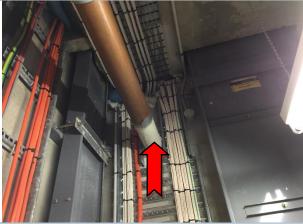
Interior: levels 1 to 6, electrical server room, pipe work – asbestos containing fire stop membrane.
